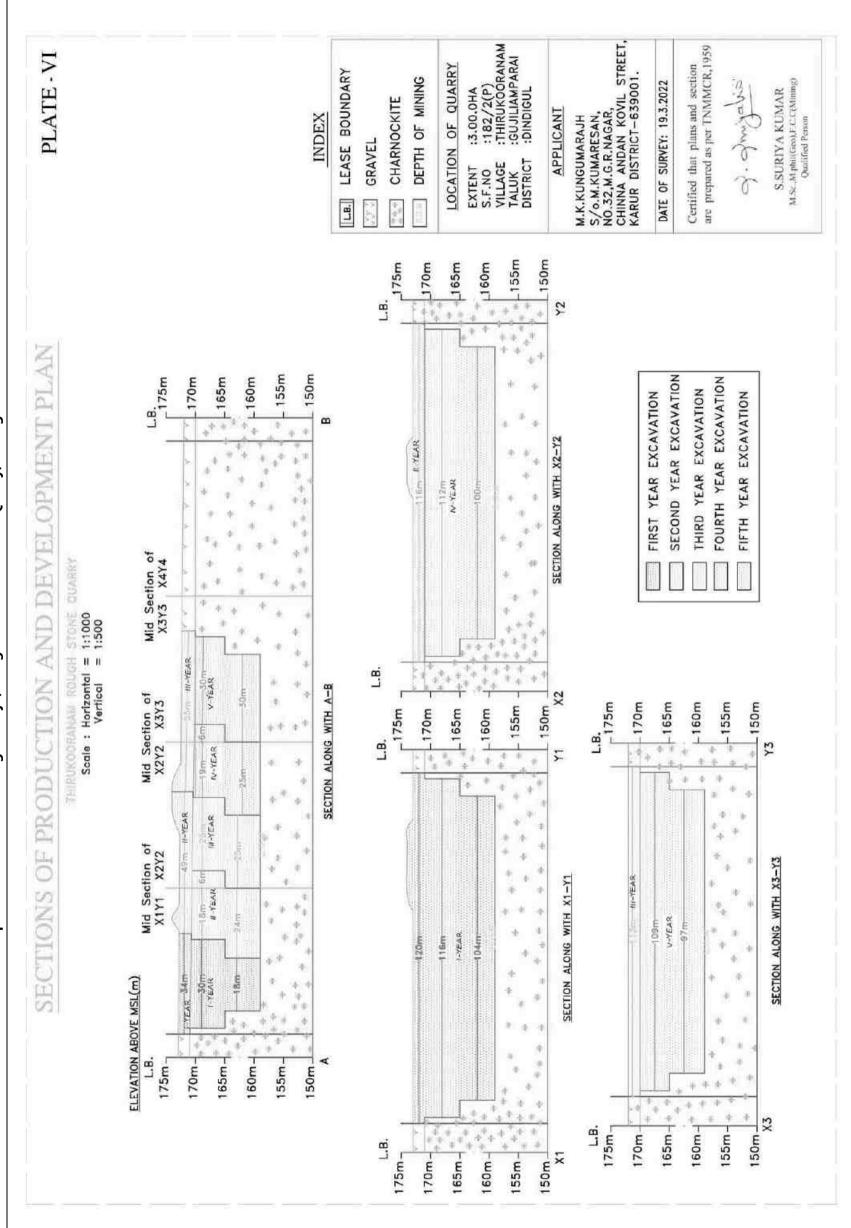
Section of Production and Development Plan (Plate – VI)
